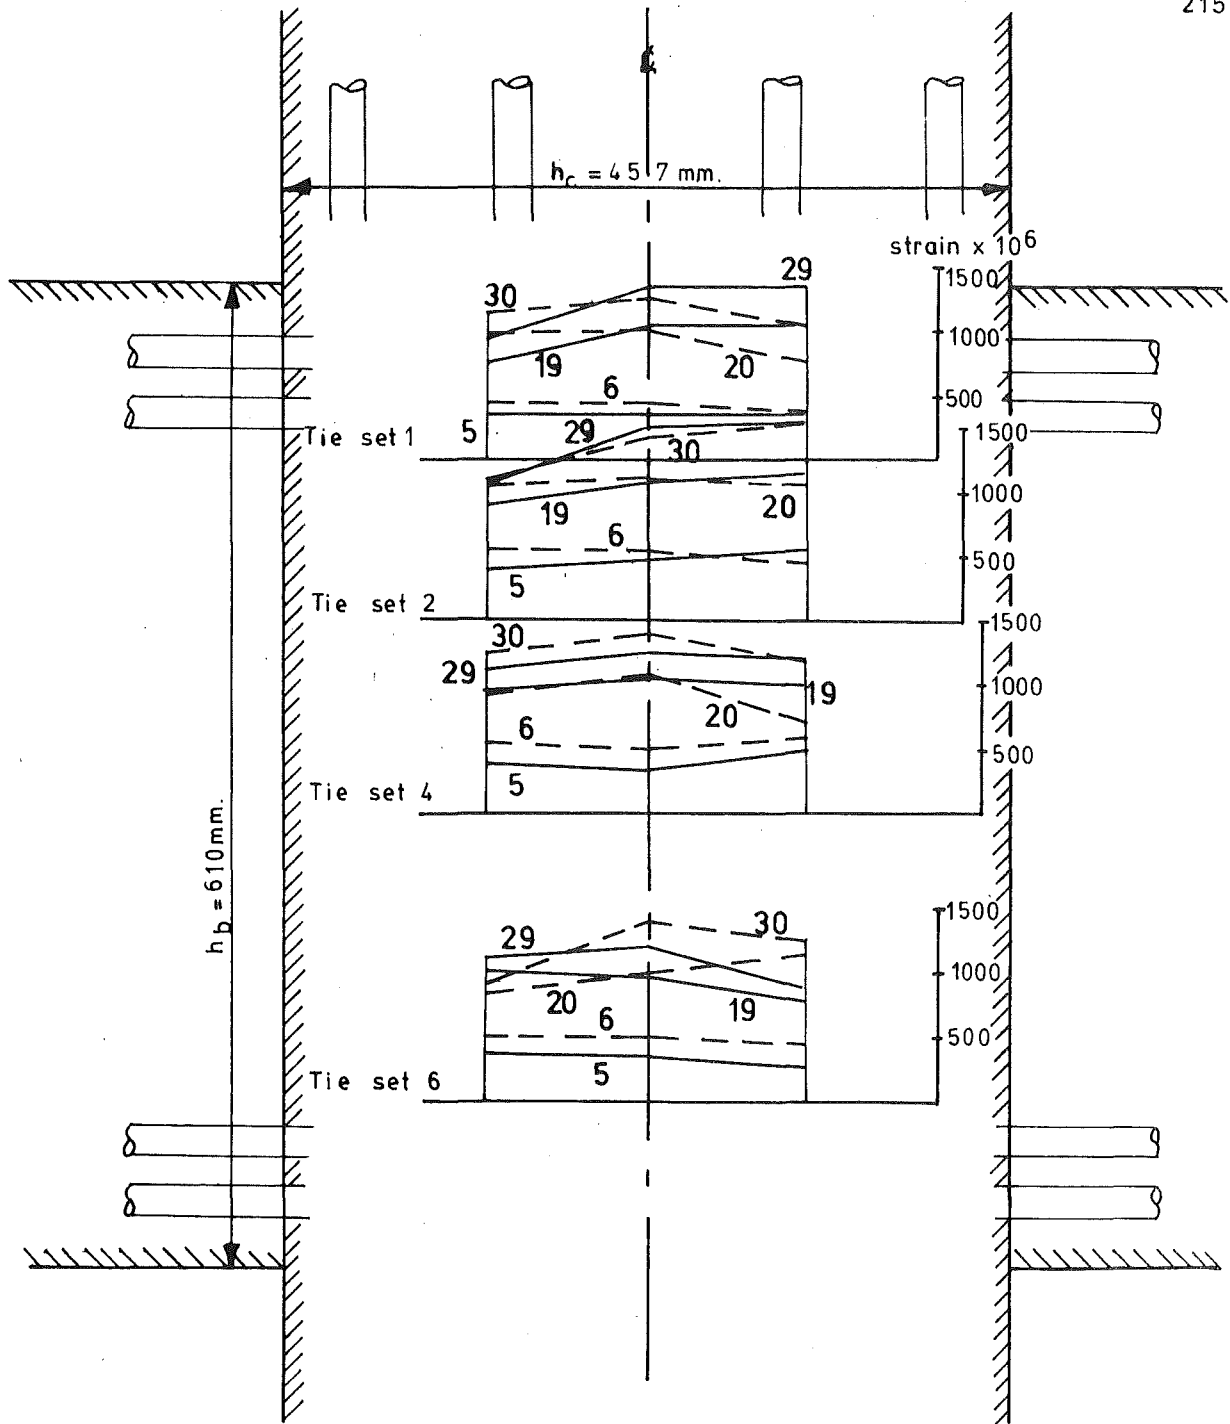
ENVELOPE OF STRAINS IN STIRRUP LEGS OF JOINT REINFORCEMENT
